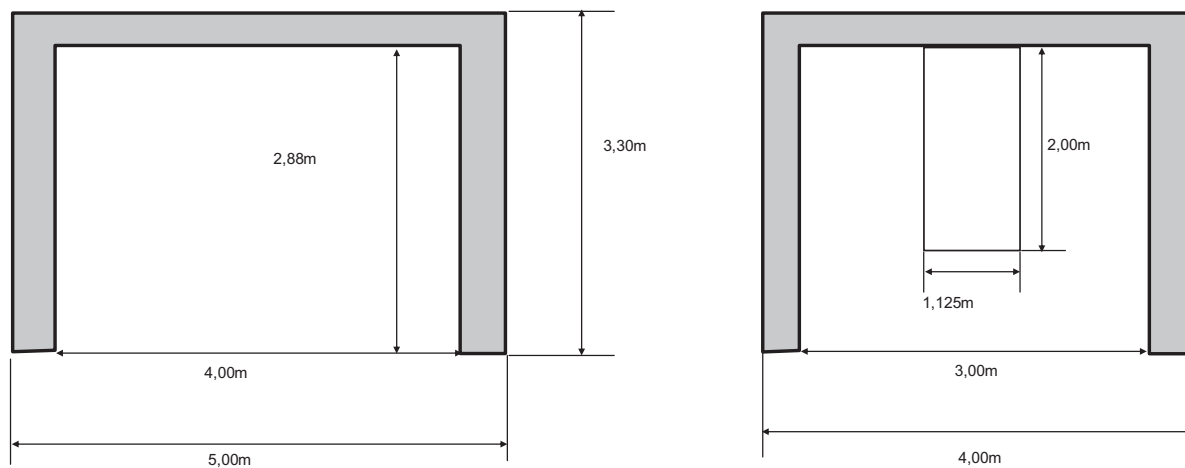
Dimensioning of the reinforced concrete frames with masonry infill in model “Oezzi”
